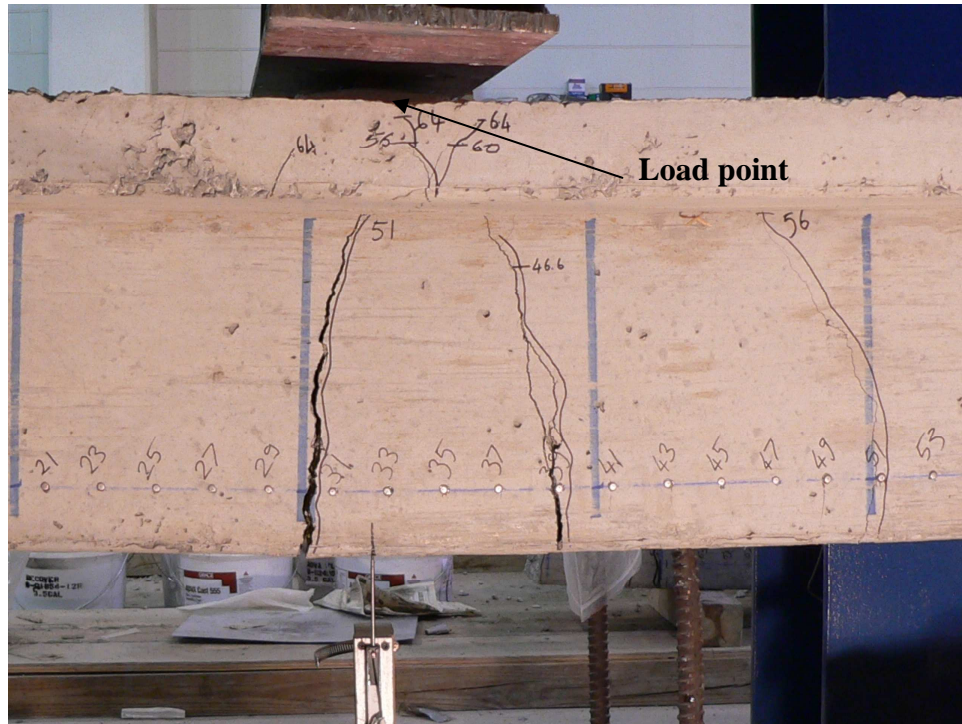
Final condition of flexural cracks at the end of test - SCC-HS-W
